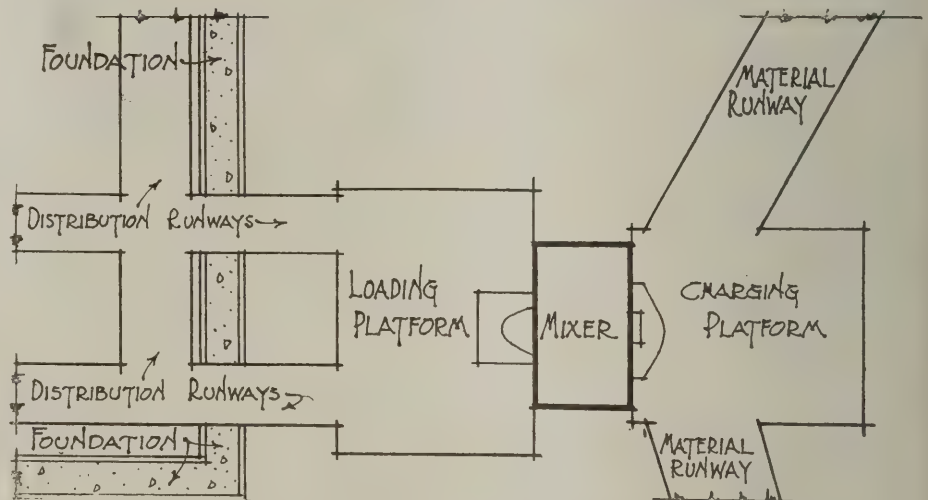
A sketch layout of a concrete mixing and distribution plant
